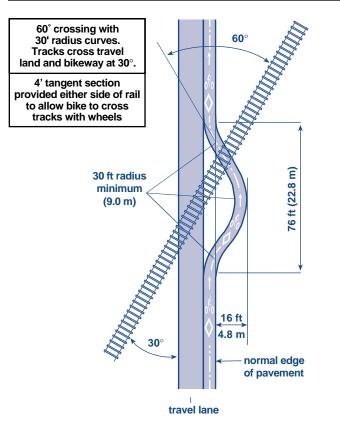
Treatment for Bike Lanes Crossing Railboad Tracks
